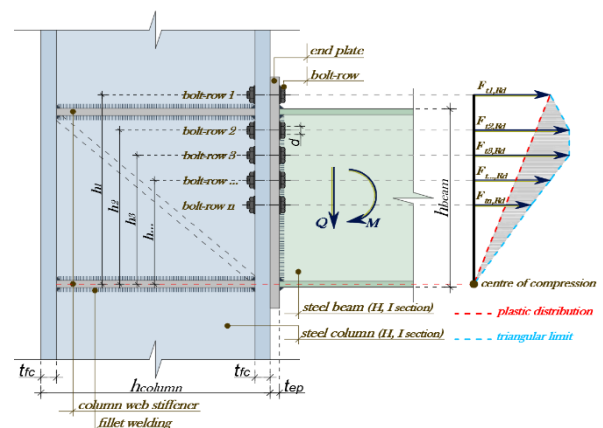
Beam-to-column end plate connection and bolt-rows tension force distribution
